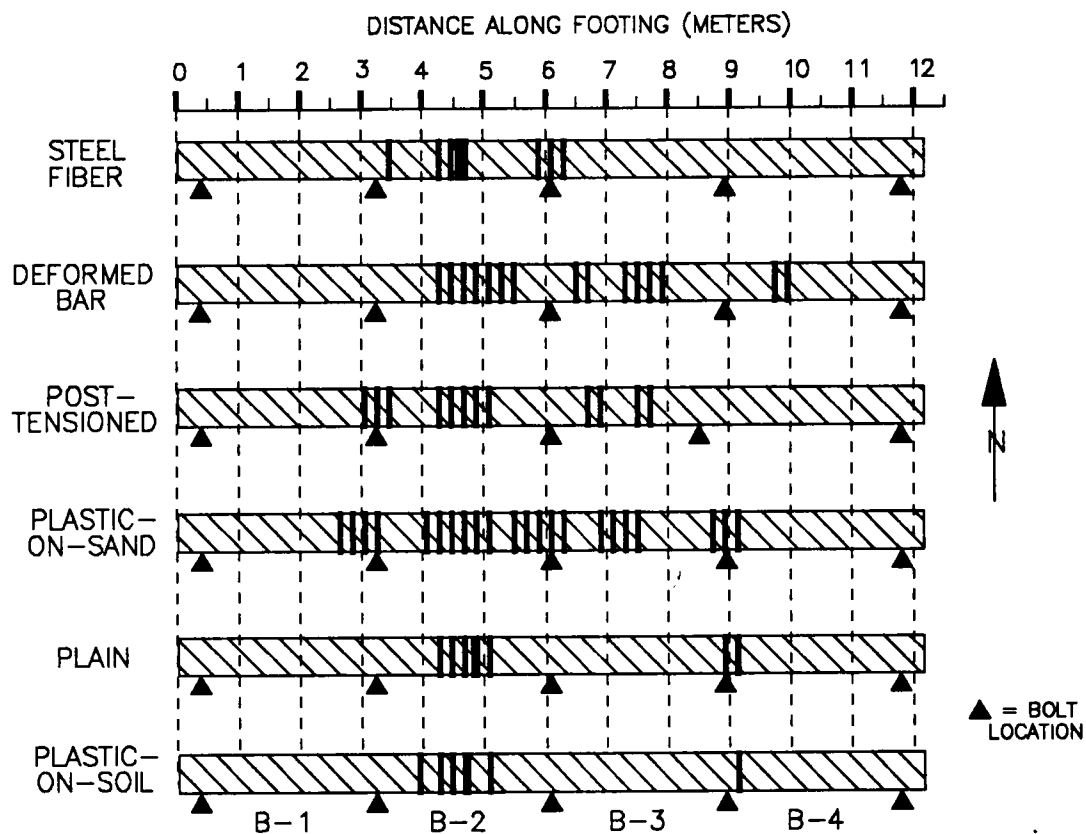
Day 90 Centerline Wall Crack - Extensometer Segment Location
